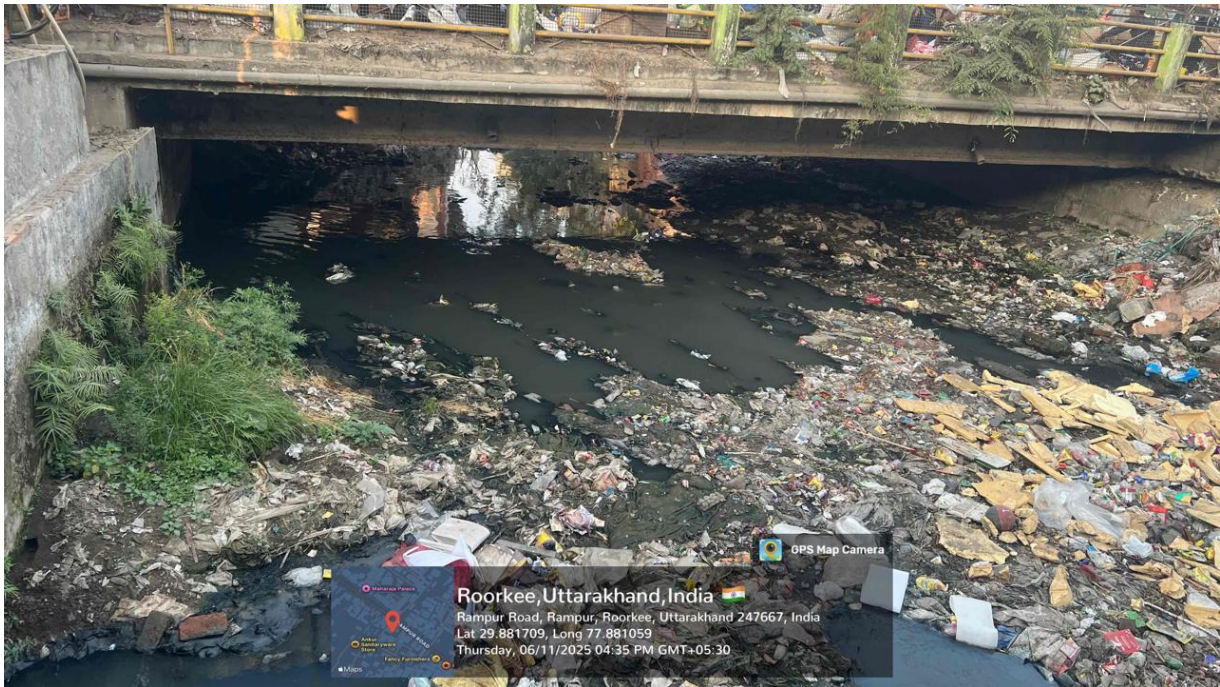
Fish Market Drain, Rampur Road, Roorkee, UK
